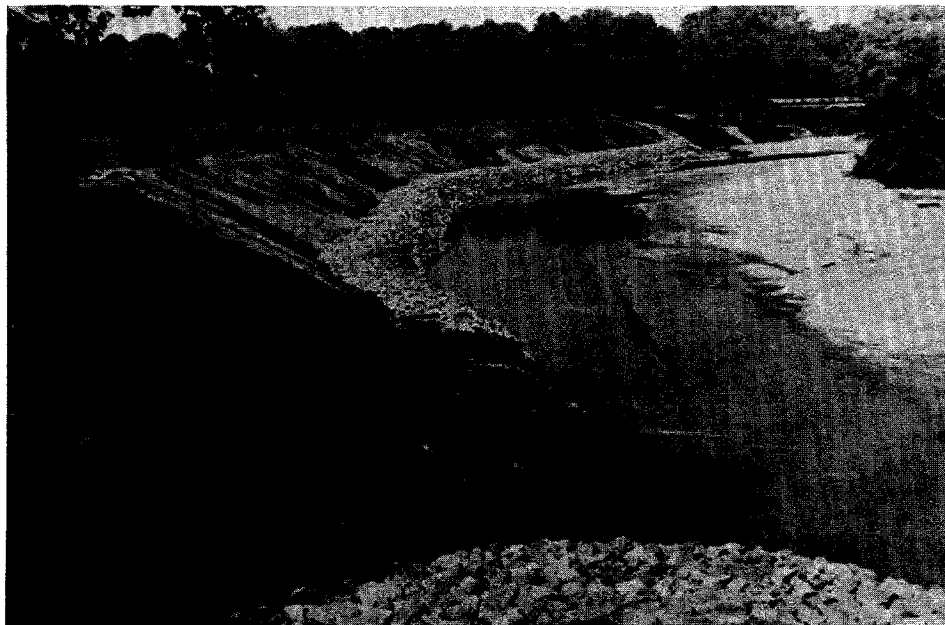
Riprap bank protection installed by Corps of Engineers on Tillatoba Creek. (From Vicksburg District, Corps of Engineers.)
